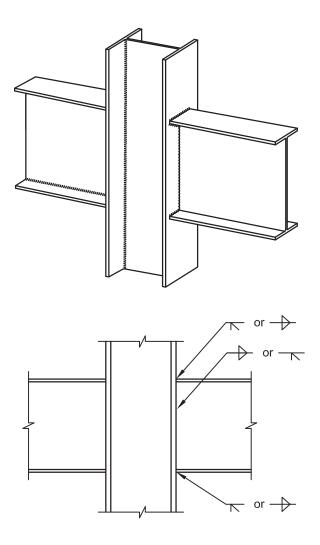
TYPICAL WELDED BEAM TO COLUMN MOMENT CONNECTION
